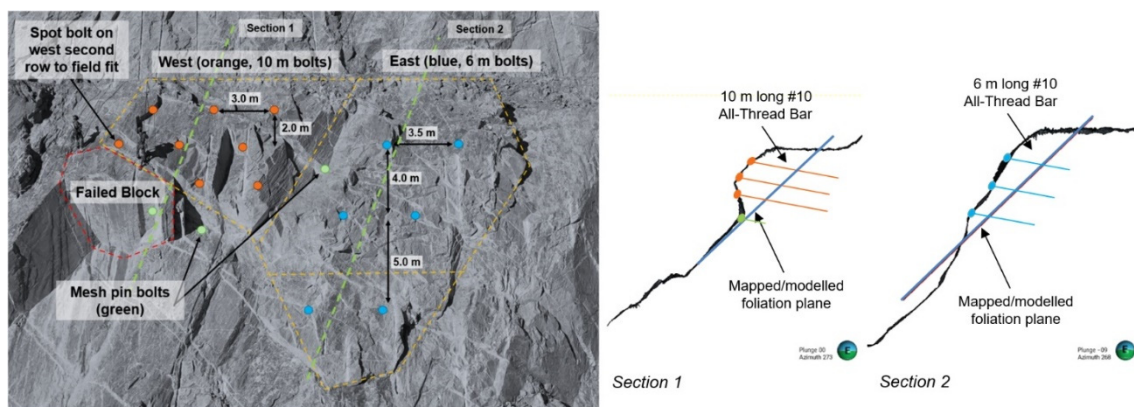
Bolting pattern design to support irregular block shape at Location 1
